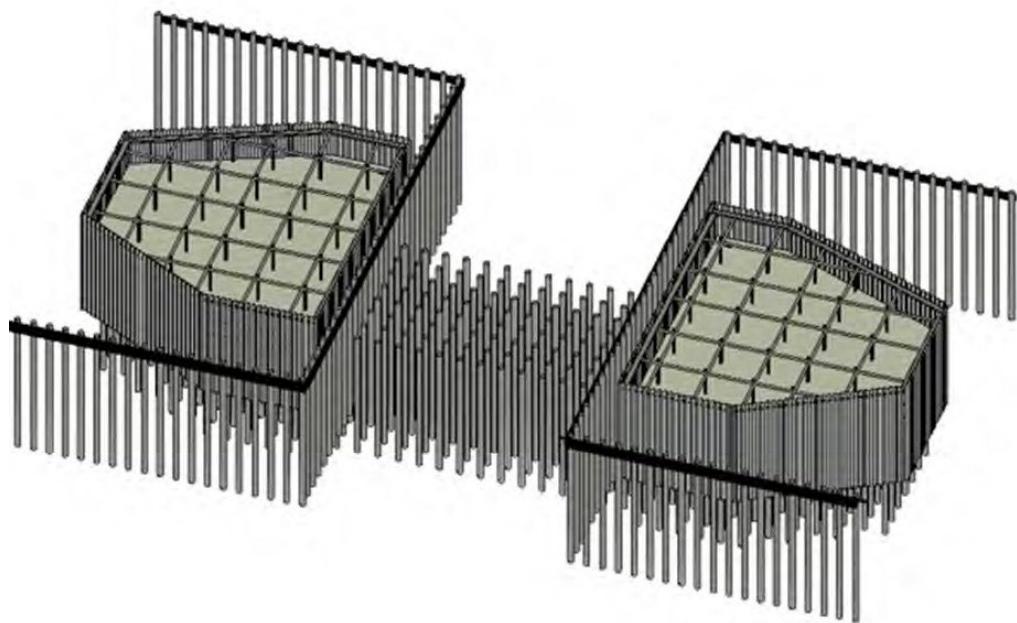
Internally Braced Cofferdam to Construct Gatebays
